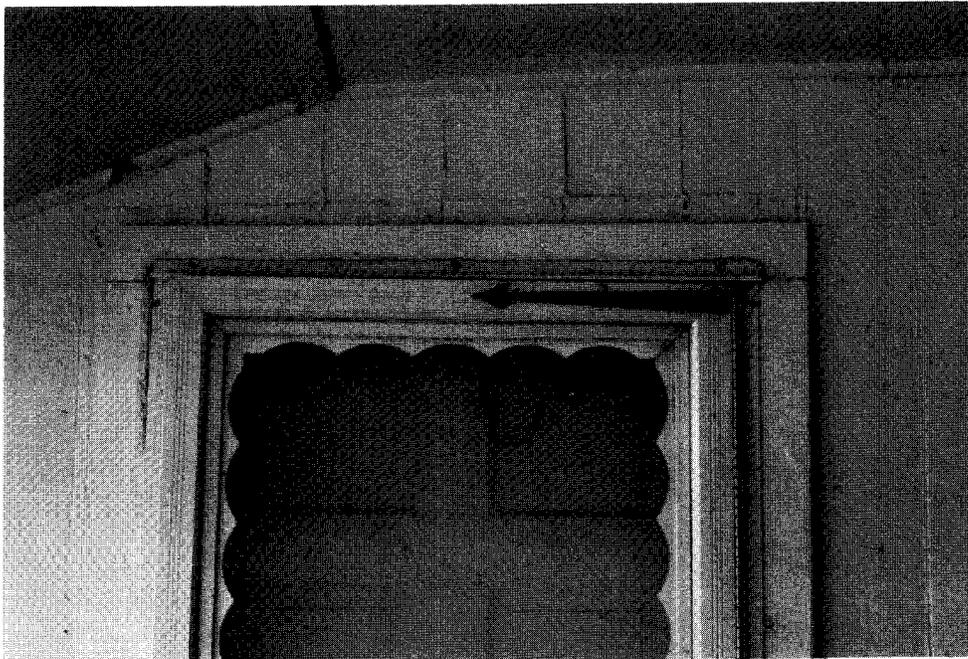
Keeper's Dwelling ell, west exterior elevation of north vestibule.
